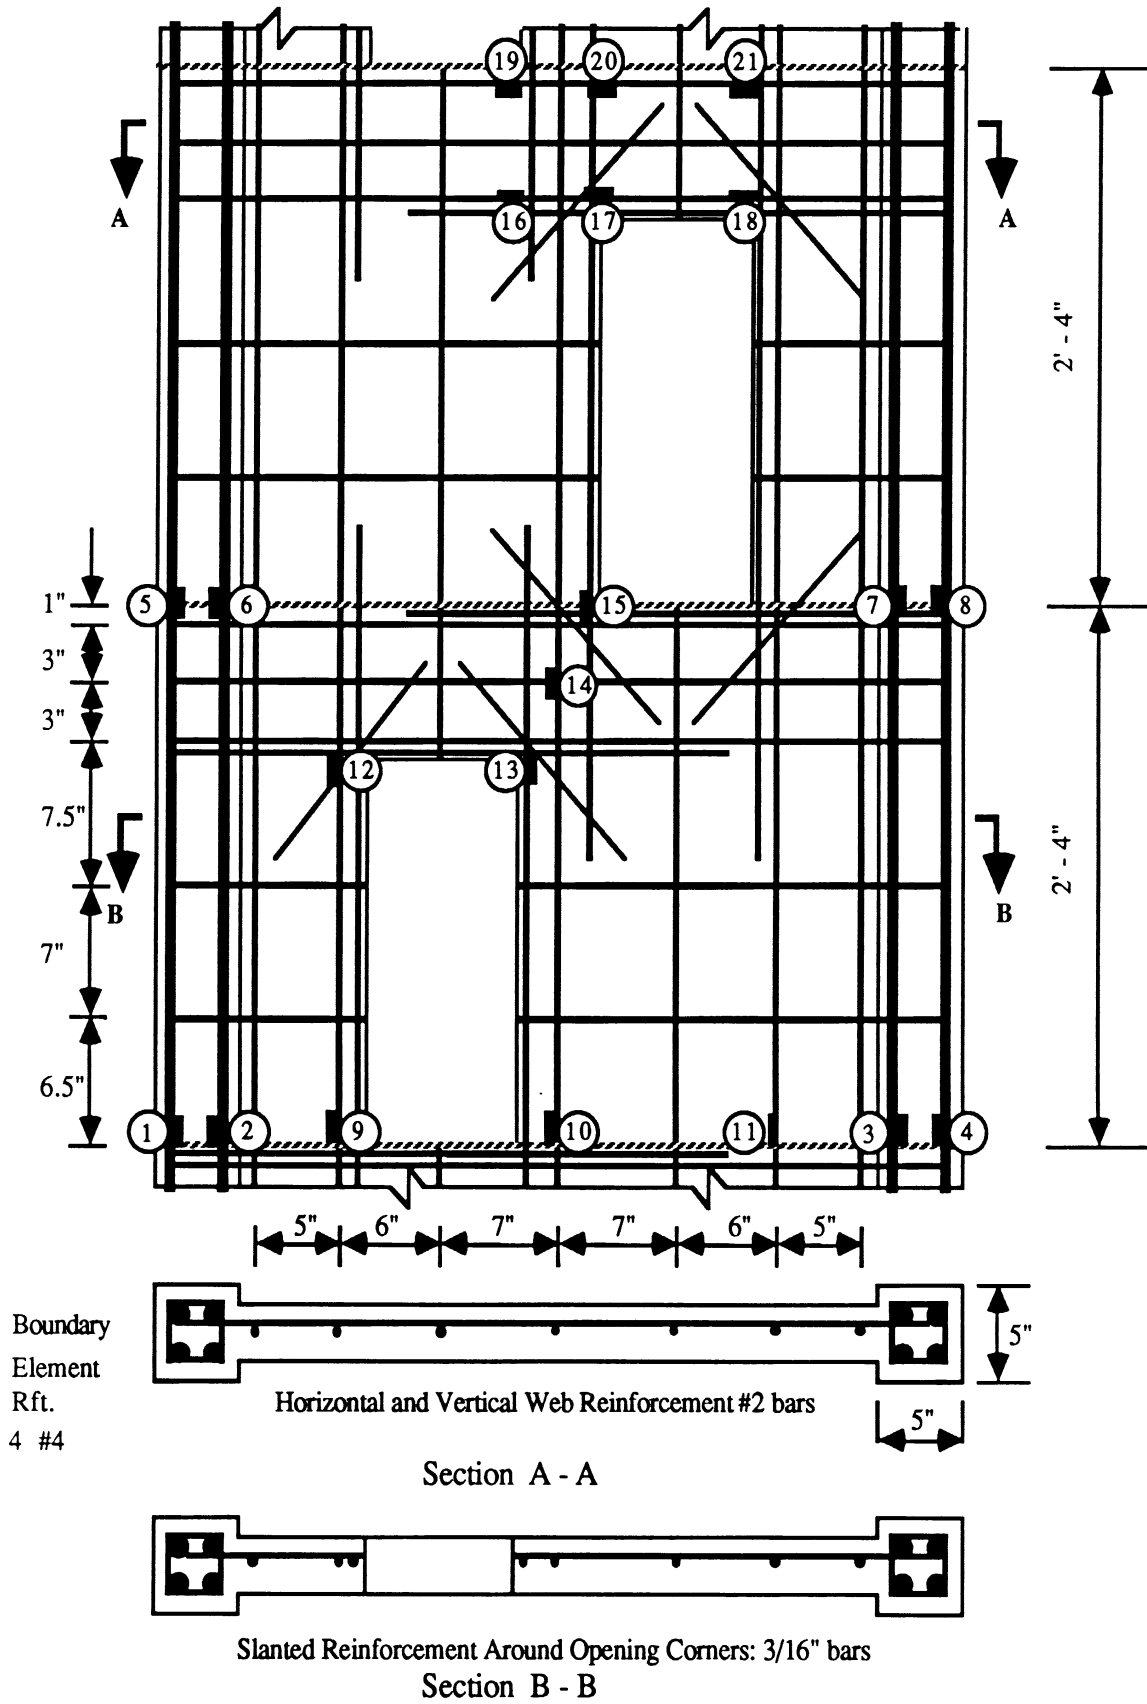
(d) : Wall Elevation with Gage Locations and Cross Sections of Specimen W-4.
